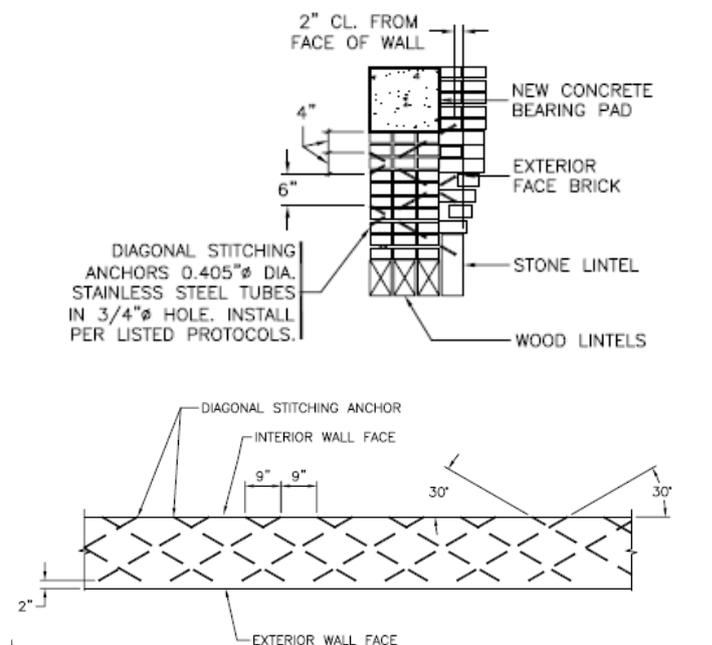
Design detail showing diagonal stitching installed as confinement reinforcement: wall section (top) and horizontal plan section (bottom). Stainless steel tubes inserted into drilled holes were injected with CIF to bond new reinforcement to surrounding masonry.
